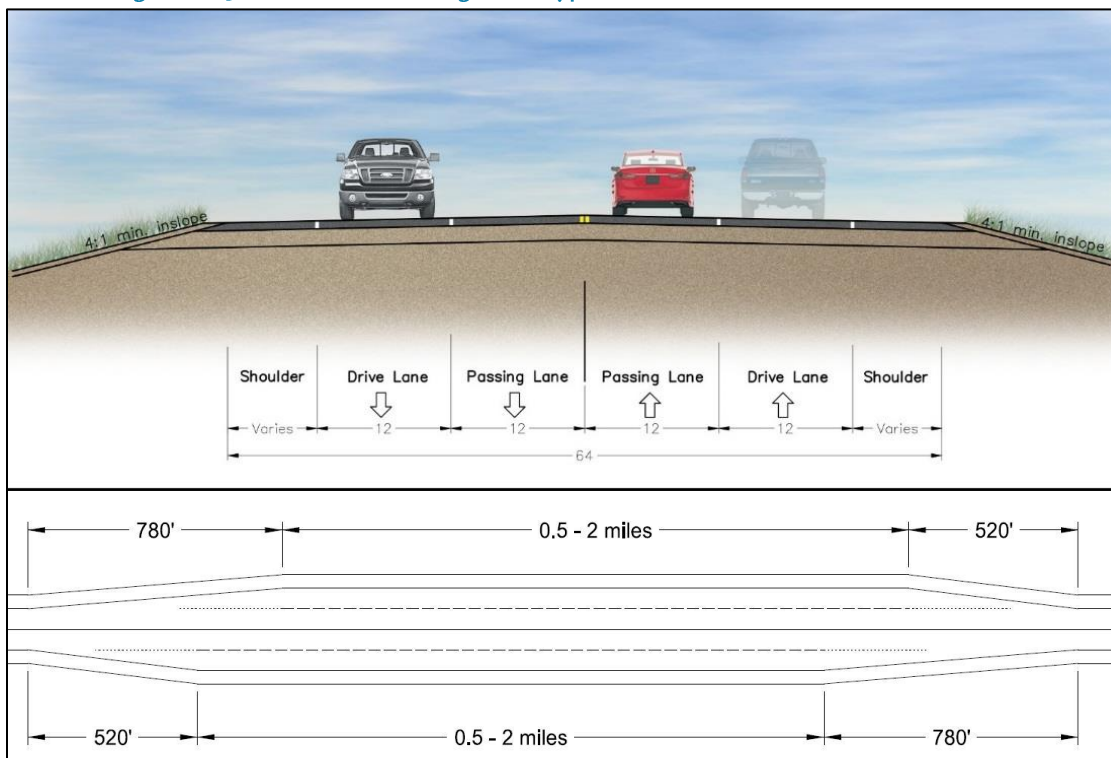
Combined Passing Lane Typical Four-Lane Section and Plan View
